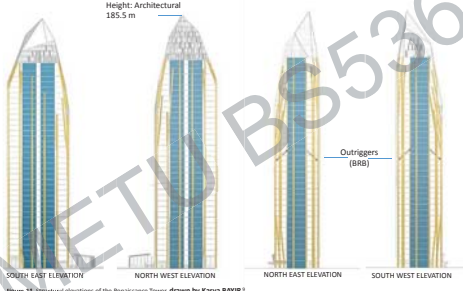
Structural elevations of the Renaissance Tower, drawn by Karya Bayir⁶
